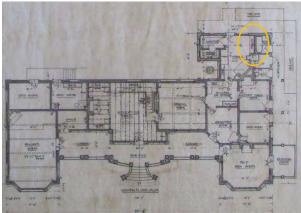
Location of subject interior wall as shown on the original plans separating the original staff bathroom from the kitchen.
